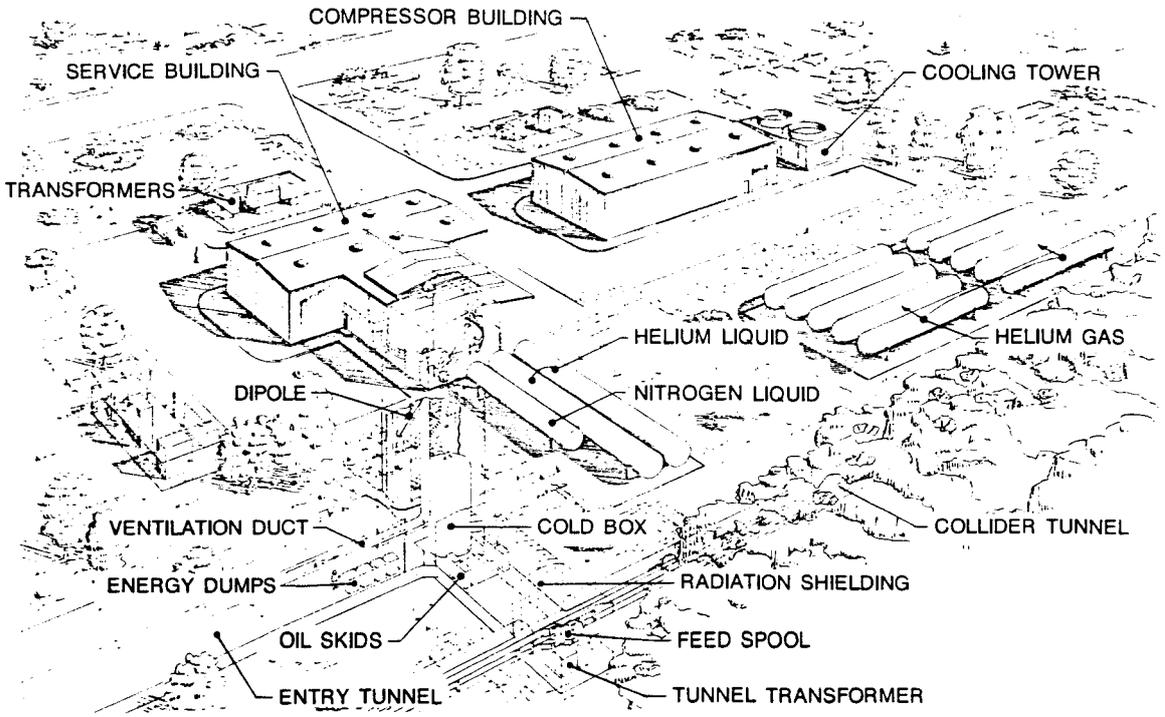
Service area showing refrigerator building with connecting access shaft to the collider ring tunnel, compressor building, and cryogenic storage yard.
